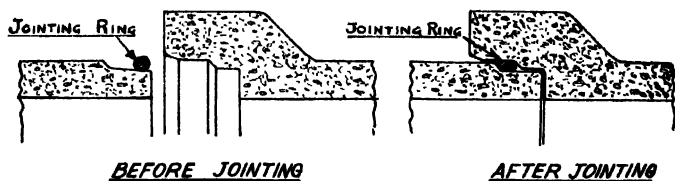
STANTON-CORNELIUS CONCRETE PIPE JOINT
